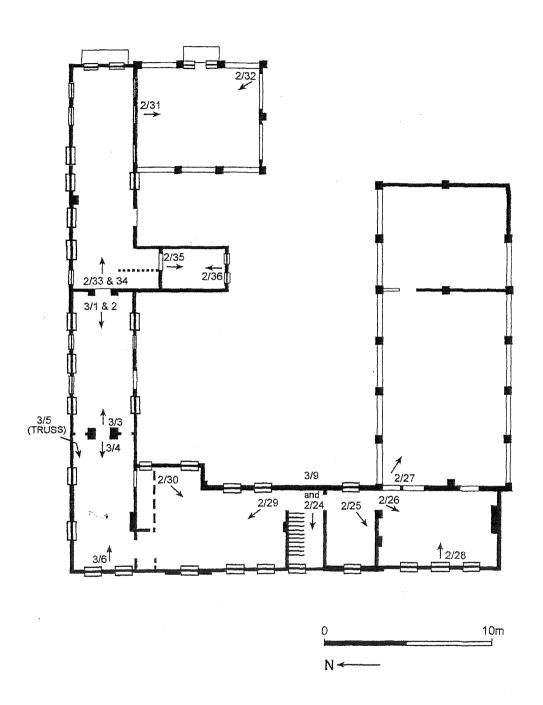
Direction of first floor photos (Based on original drawings by BLB Architects of Redditch
